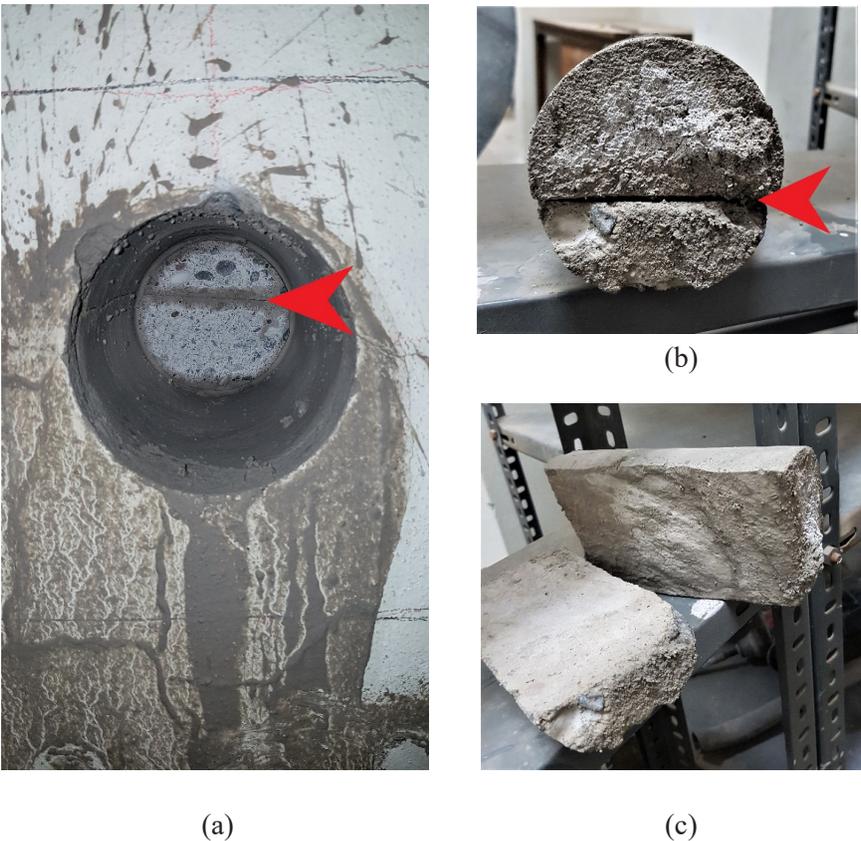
Sample of a Cold Joint: (a) Location of the Core Drilling Process, (b) Core Sample with Cold Joint, and (c) Surfaces of the Cold Joint
